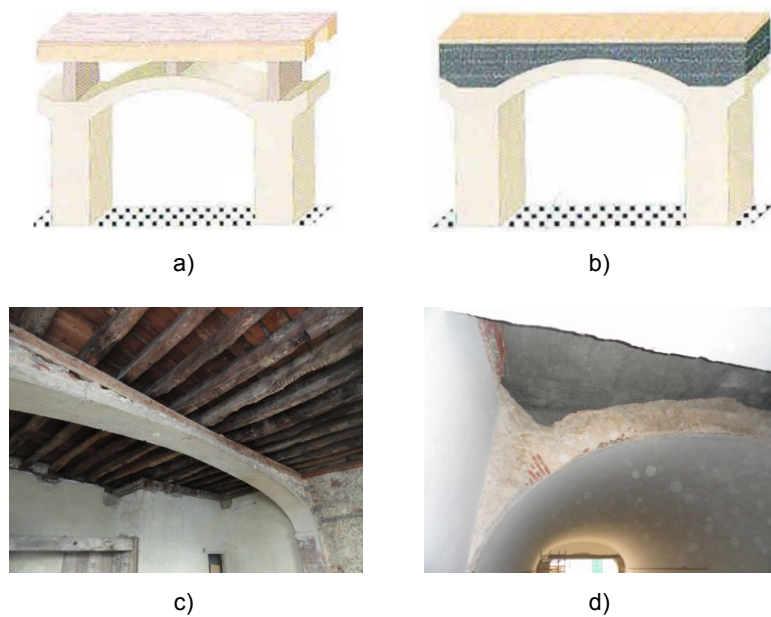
Representation of the floor structure: a) and c) Arch covered with timber frame structure (Appleton, 2003); b) Arch covered with rubble infill (Appleton, 2003); d) Cut over an arch with no infill.
